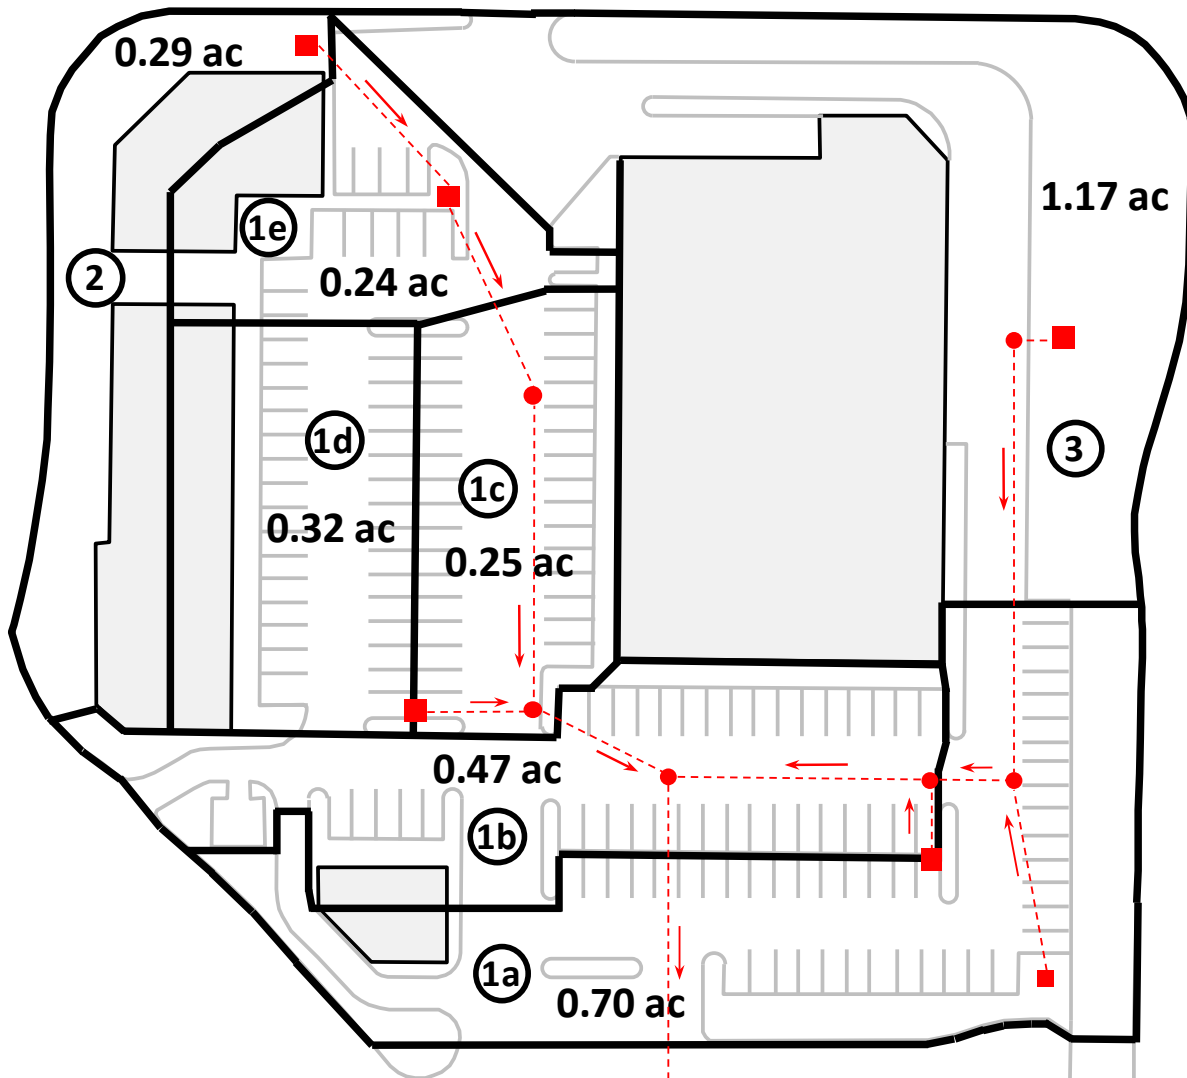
EXAMPLE 2 DEVELOPMENT PLAN
